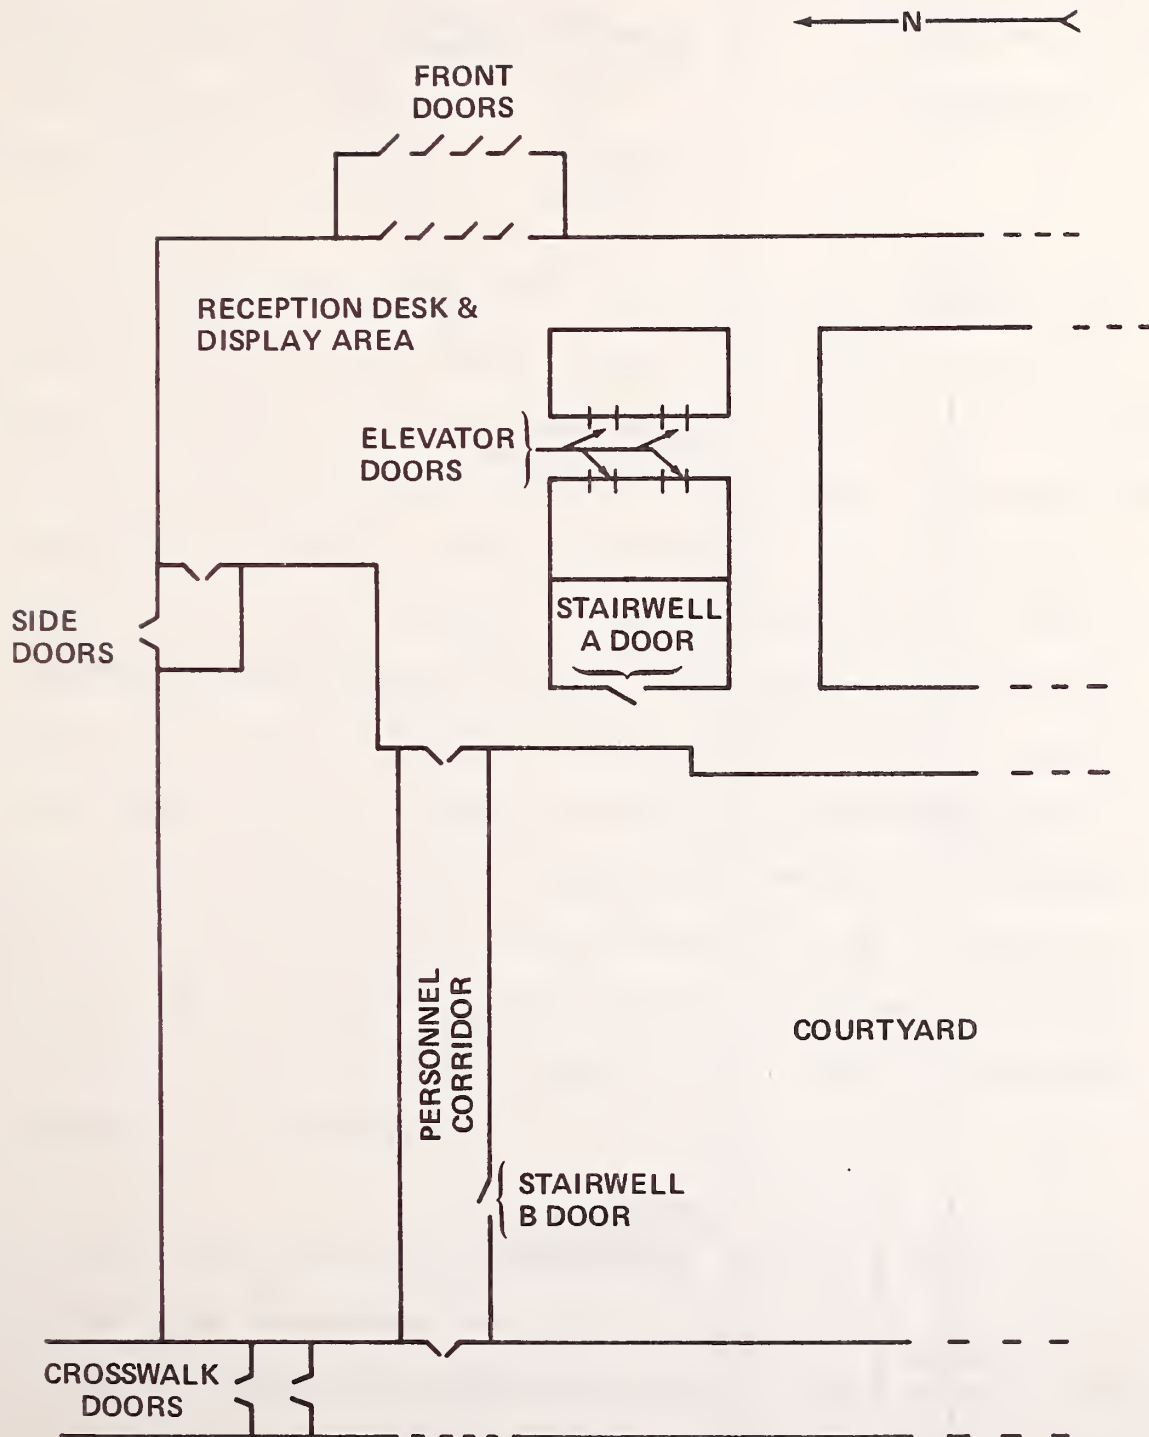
ROUGH SKETCH OF PART OF FIRST FLOOR OF BUILDING 101
